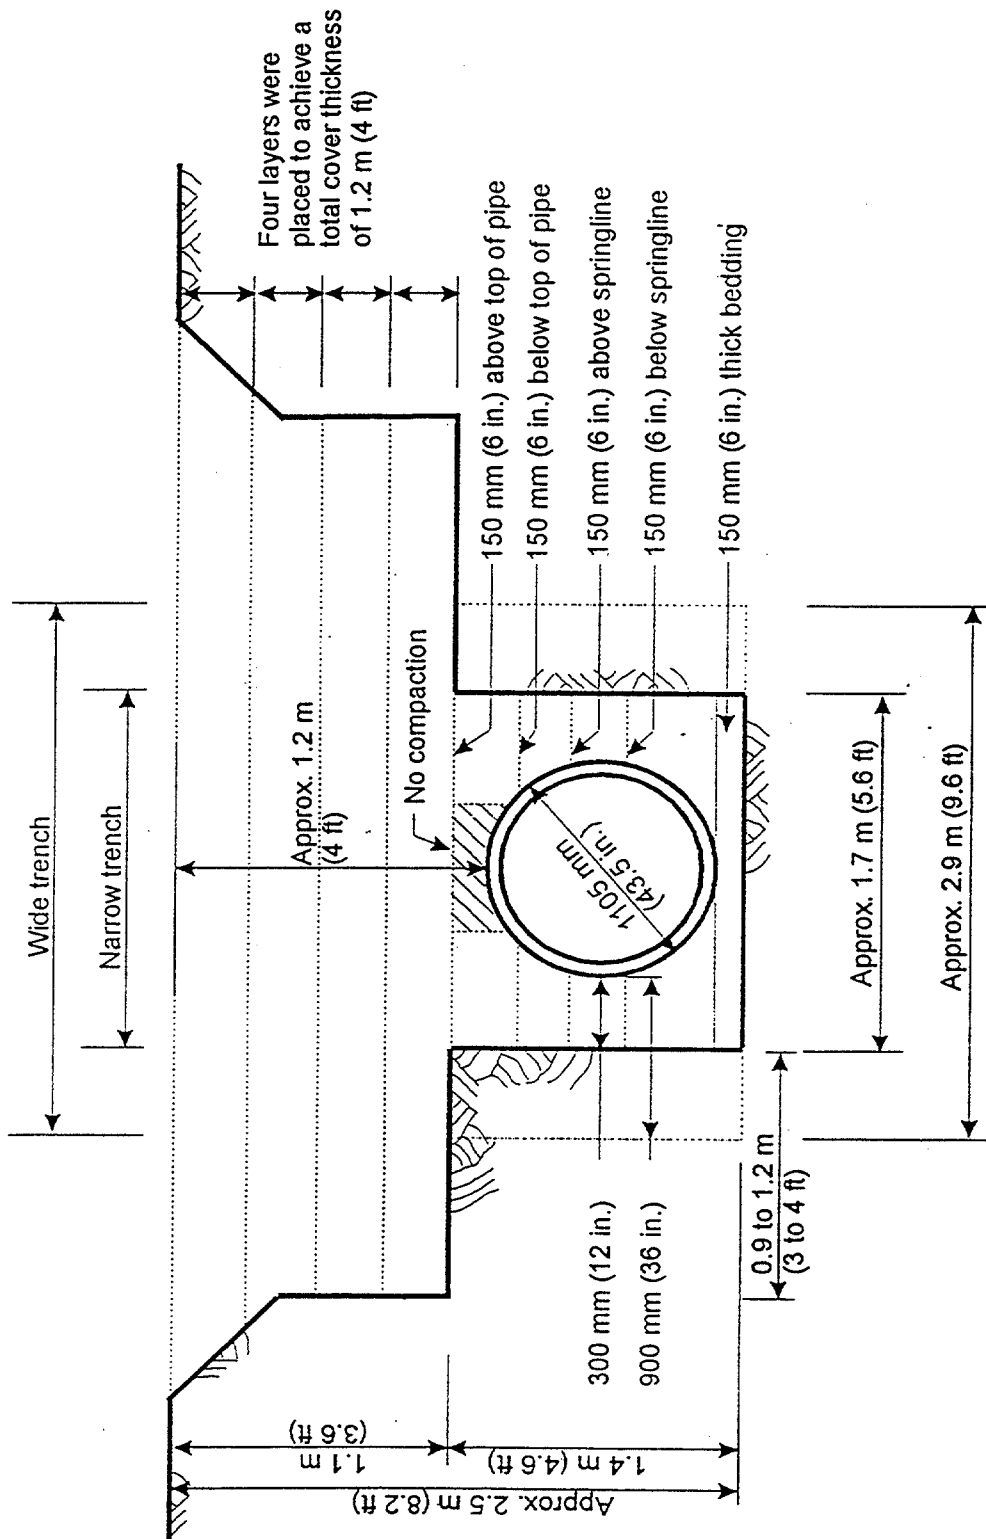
Typical Trench Cross-Section and Backfill Layer Thicknesses for 900 mm (36 in.) Diameter Concrete Pipes (Section for Plastic and Metal Pipes Similar)
